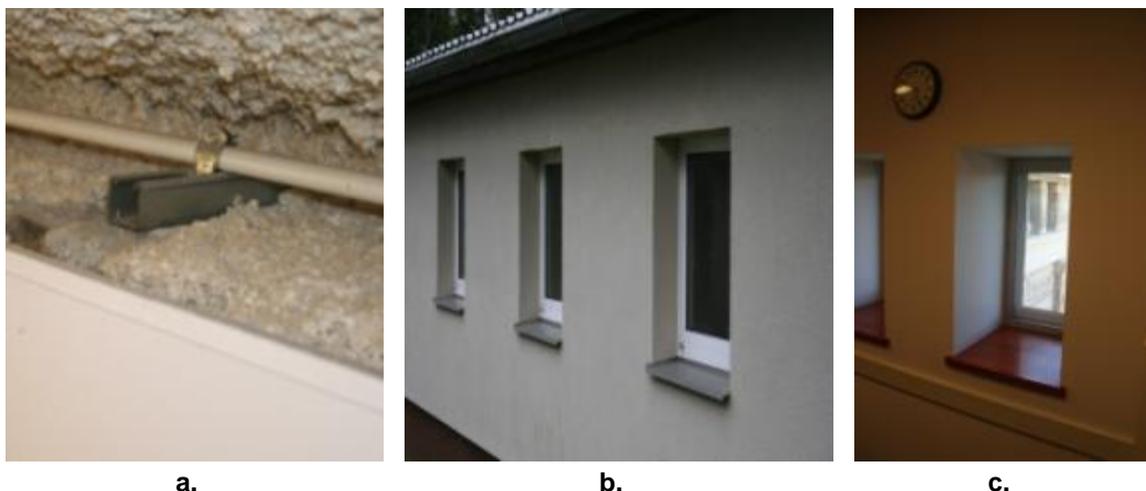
Retrofitted Army barracks with exterior insulation (a), interior insulation of the retrofitted administrative building at the Rock Island Arsenal (b, c).
